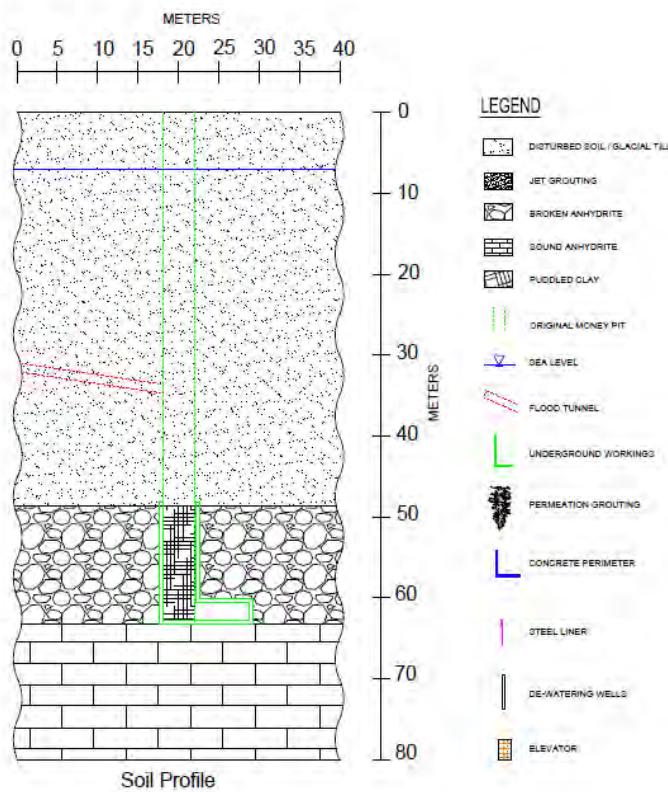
Cross-section of the soil profile through the center of the proposed 24 m diameter shaft
